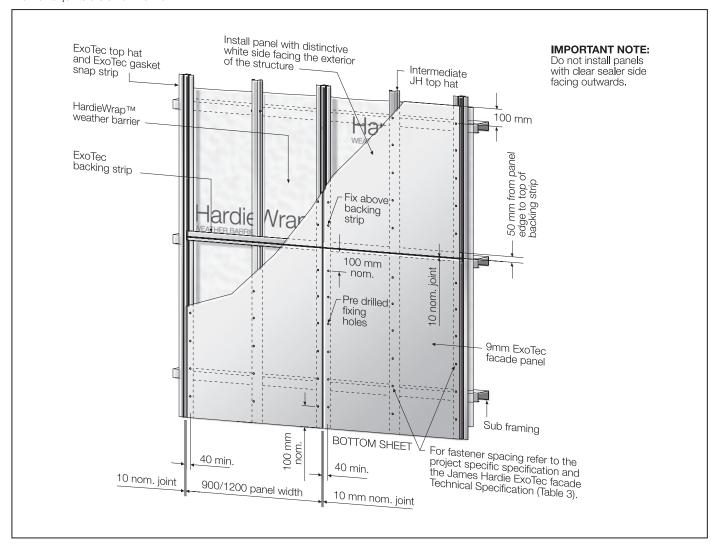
TYPICAL PANEL AND FRAMING LAYOUT
